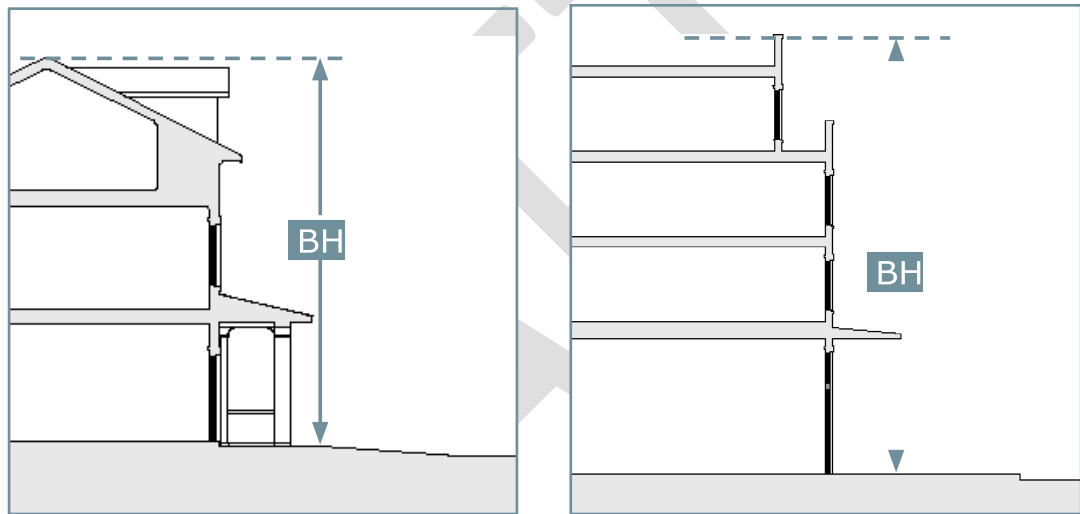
Image showing how to measure building height for a sloped roof (left) and flat roof (right).
